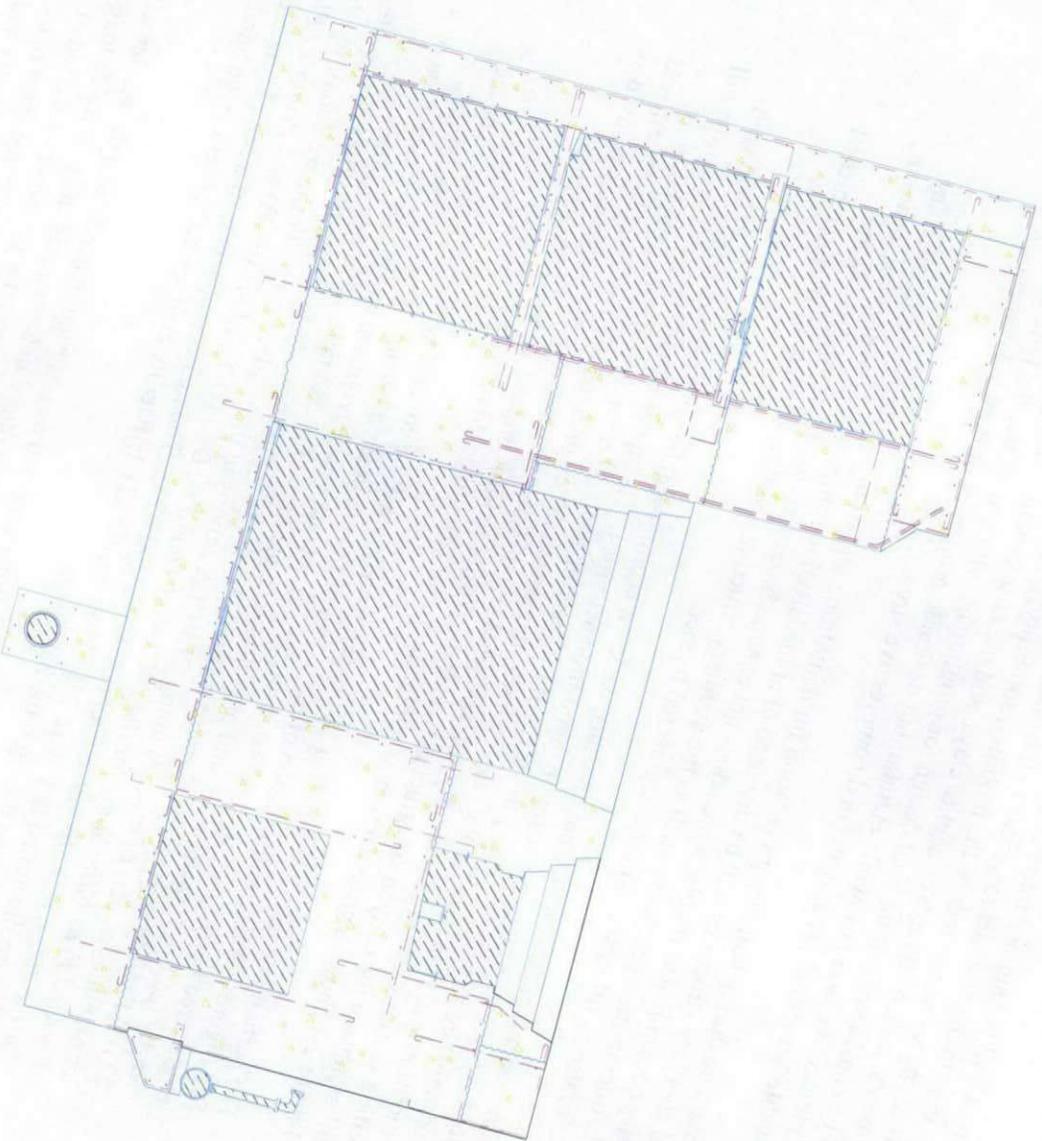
Cross Section of the Partially Demolished 221-U Building.
